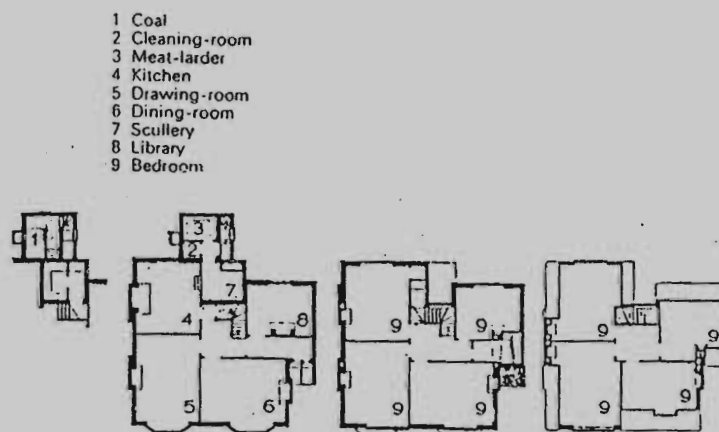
Shaw. *Plan: Garden Suburb, Bedford Park, London. (c. 1880).
